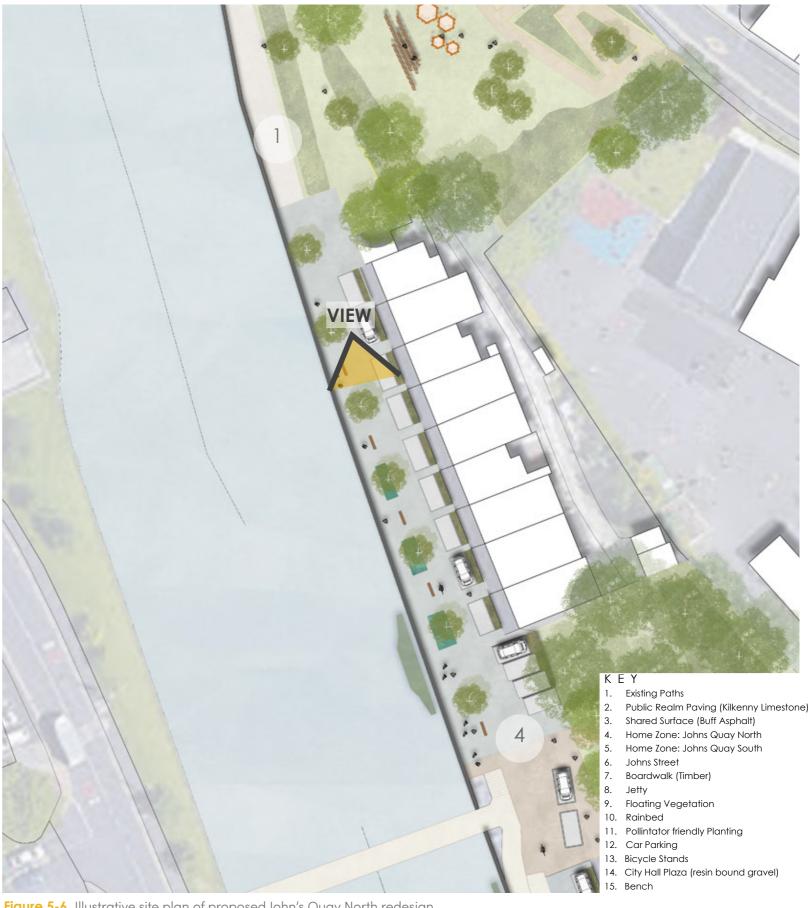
Illustrative site plan of proposed John's Quay North redesign.
